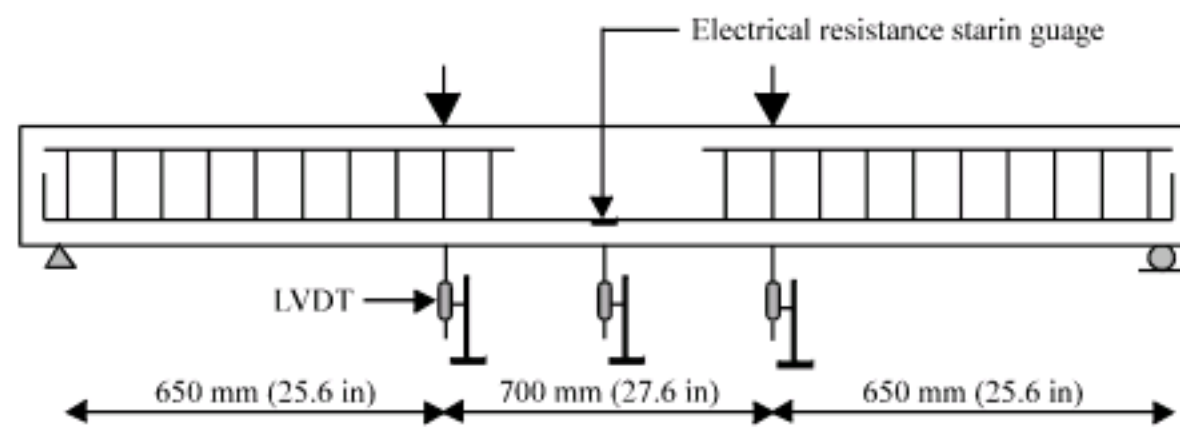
Typical strengthened beams showing the position of LVDT and electrical resistance strain gauge (front elevation)
